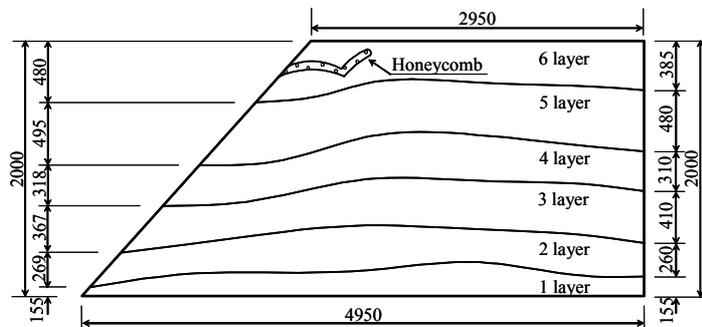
Concrete surface after formwork removal (gable at furthest point)
